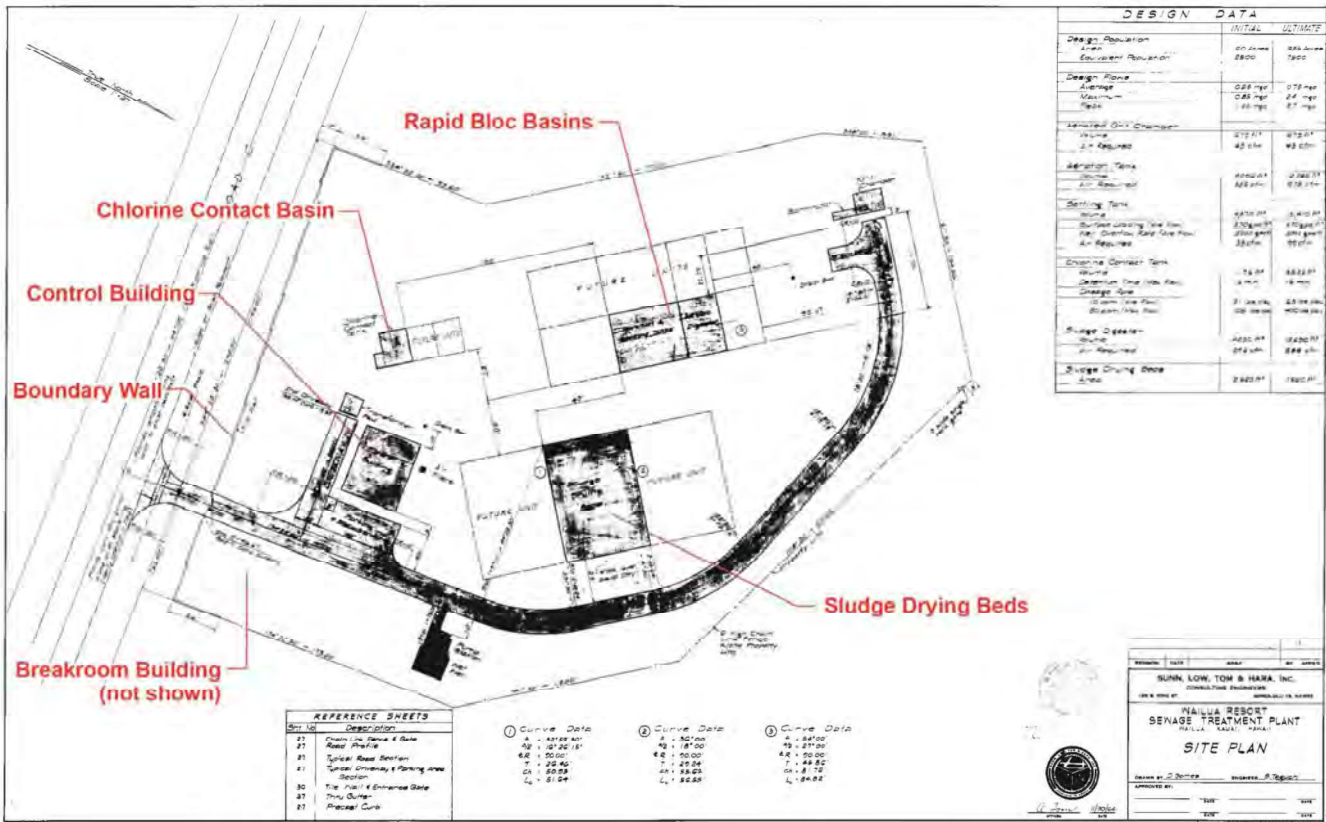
Wailua Wastewater Treatment Plant Site Plan, 1964.
